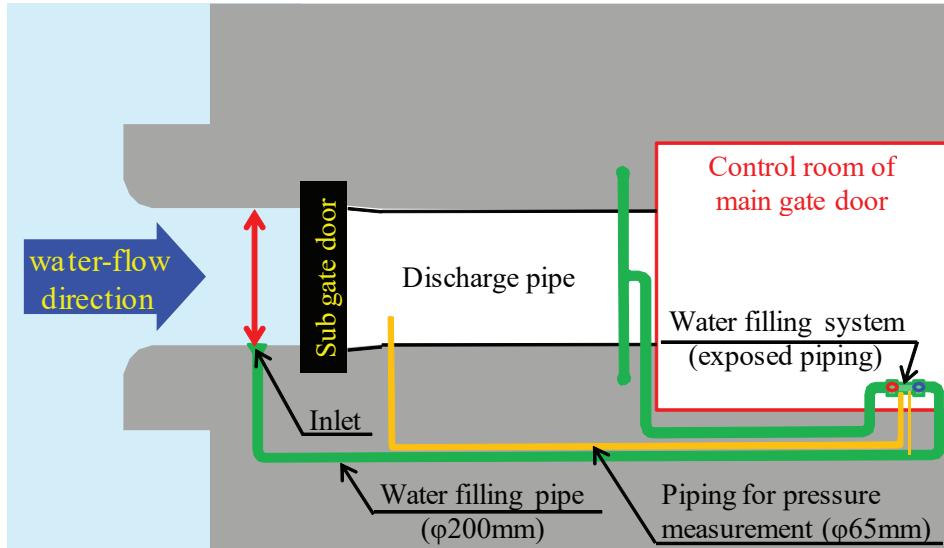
Water filling system layout drawing of Hiyoshi Dam (Top view of A-A section in Figure 10)
